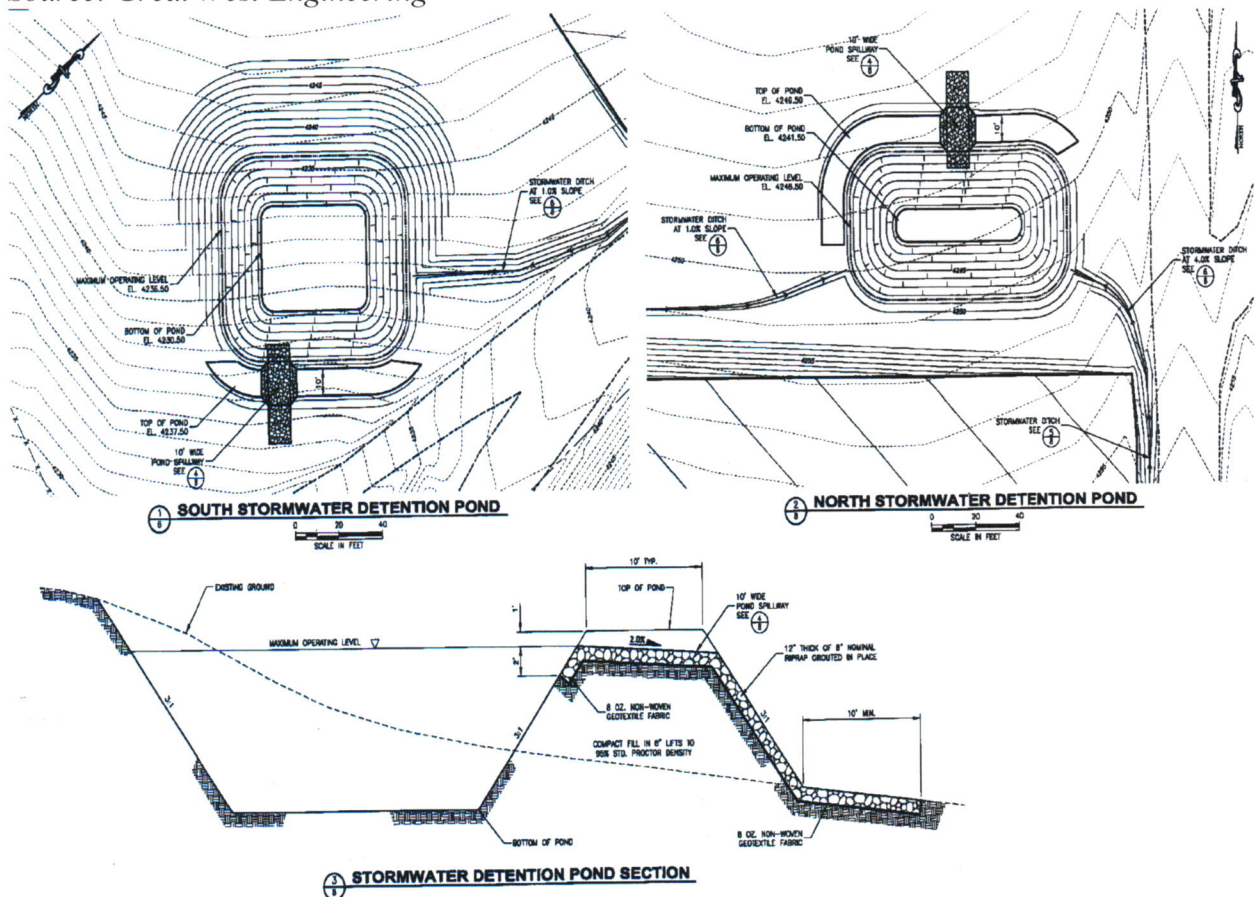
Proposed Expansion Area – Storm Water Detention Ponds Design Details
